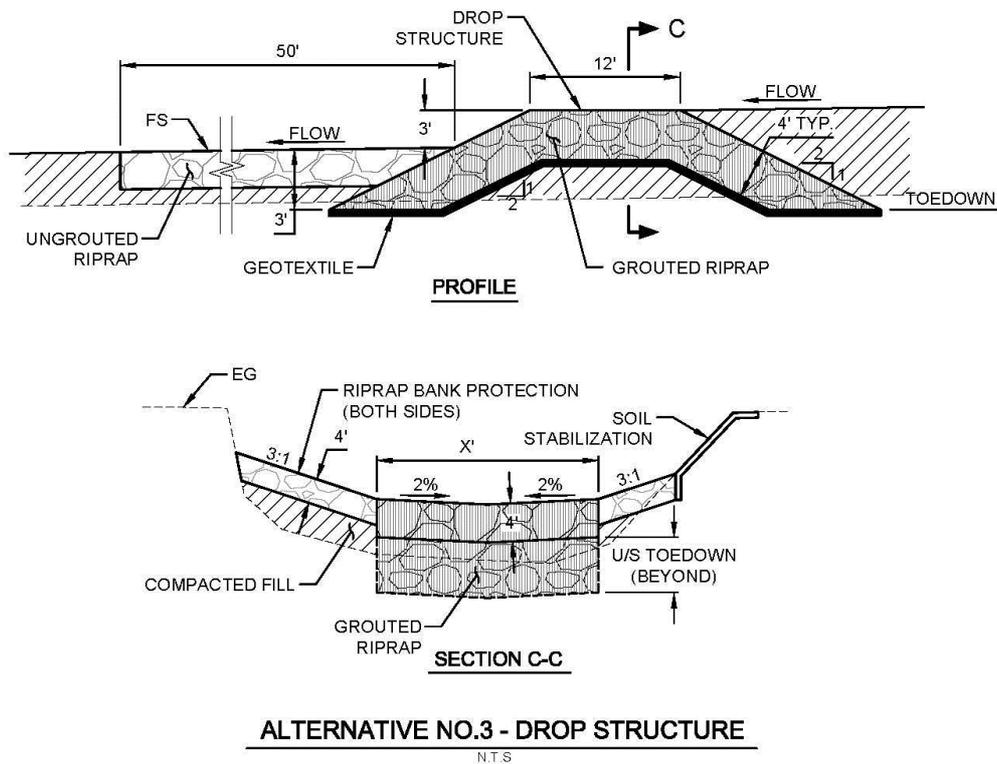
Typical Section of Drop Structures (Alternative 3)
